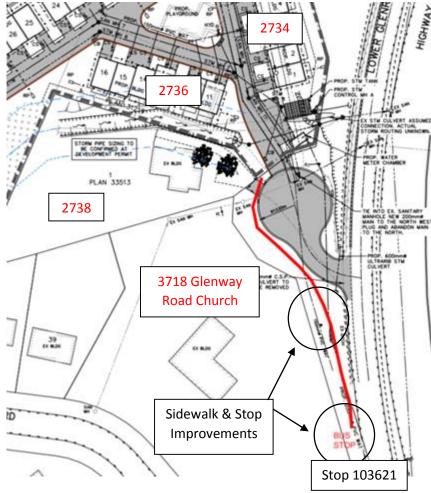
Sidewalk and Bus Stop Improvements. Also note new cul-de-sac.
